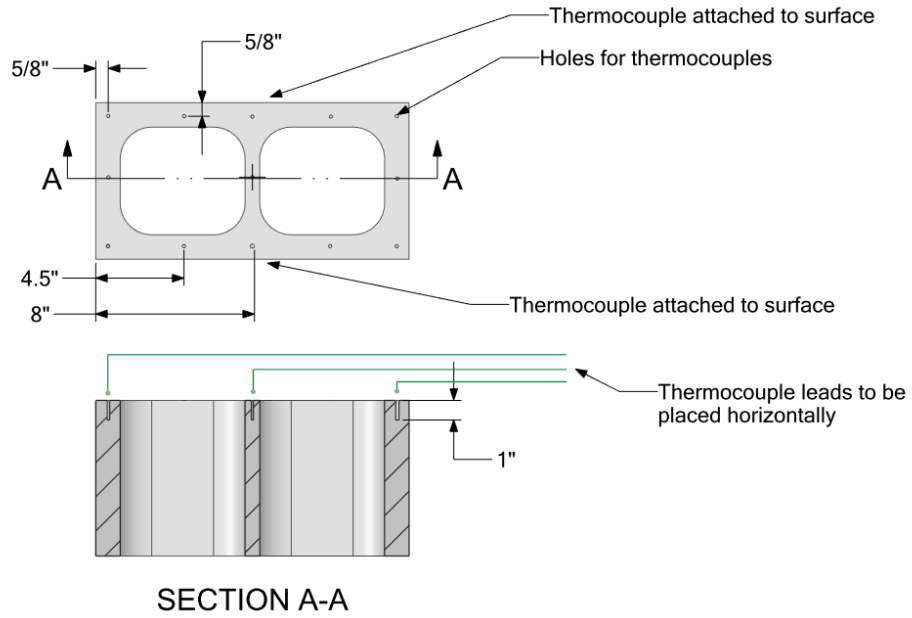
Masonry wall: Location of thermocouples for instrumented blocks
